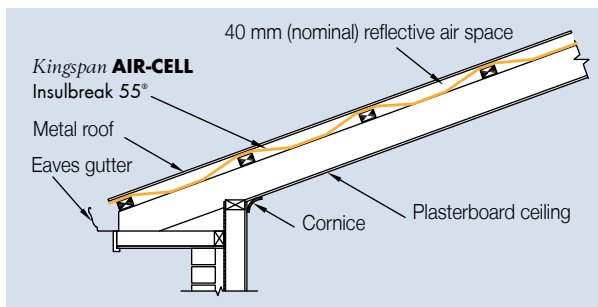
Side elevation of *Kingspan AIR-CELL Insulbreak® 55* in a metal roof with a raked ceiling
